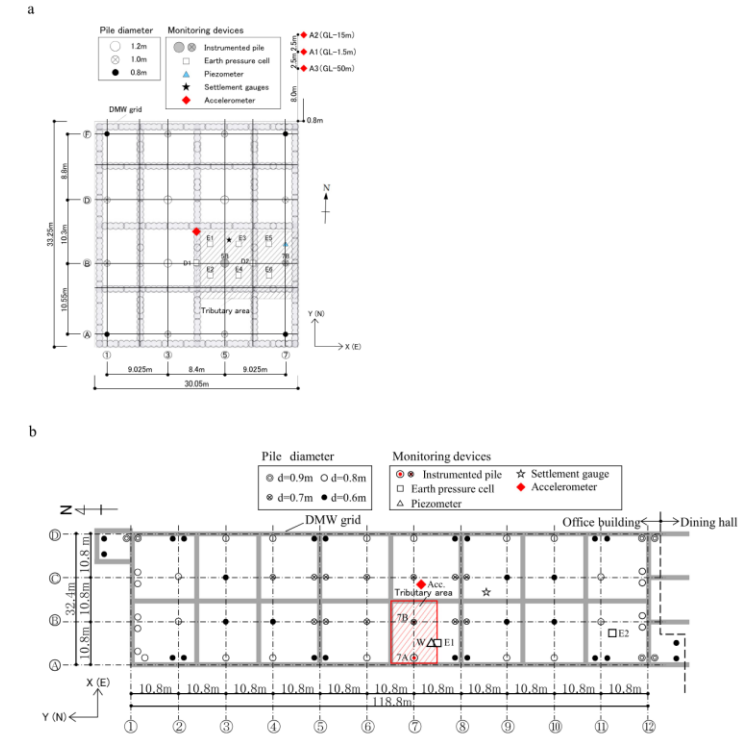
Foundation plan views of (a) IS building and (b) NI building with locations of monitoring devices.
